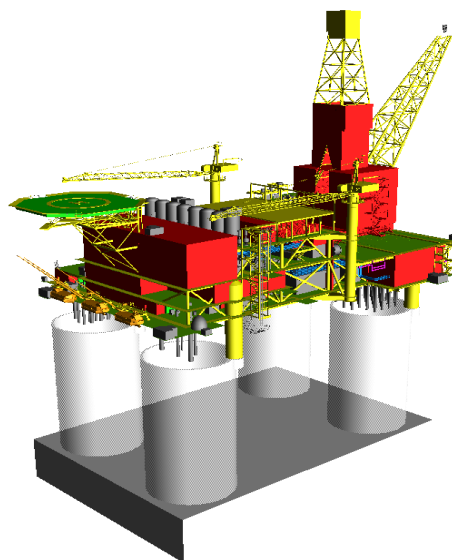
Ice-resistant stationary reinforced concrete Lun-A platform (“Sakhalin 2”, Russia) [2]
